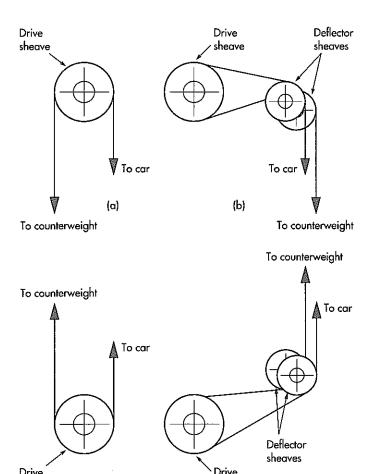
Machine position; (a) top drive, machine above, (b) top drive, machine adjacent, (c) bottom drive, machine below, (d) bottom drive, machine adjacent
